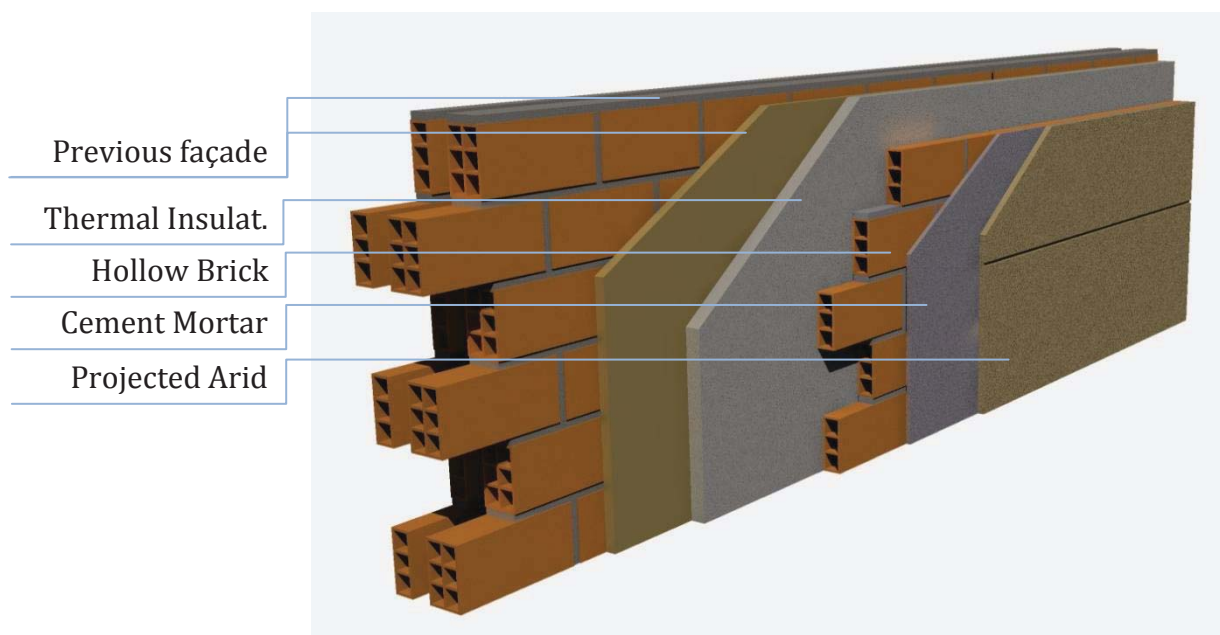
5. Façade constructive section (according to Bilbao Social Housing renovation in 1989)
